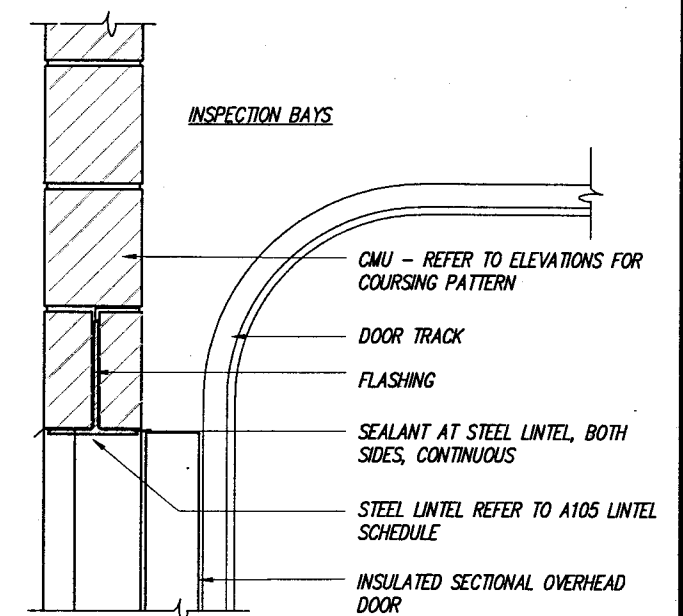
DETAIL - INTERIOR DOOR JAMB (TYP.)
